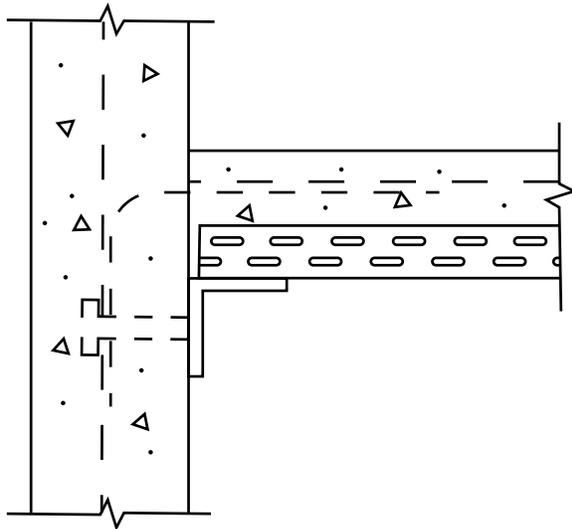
CONCRETE OR CMU WALL LEGER DECK PERPENDICULAR
